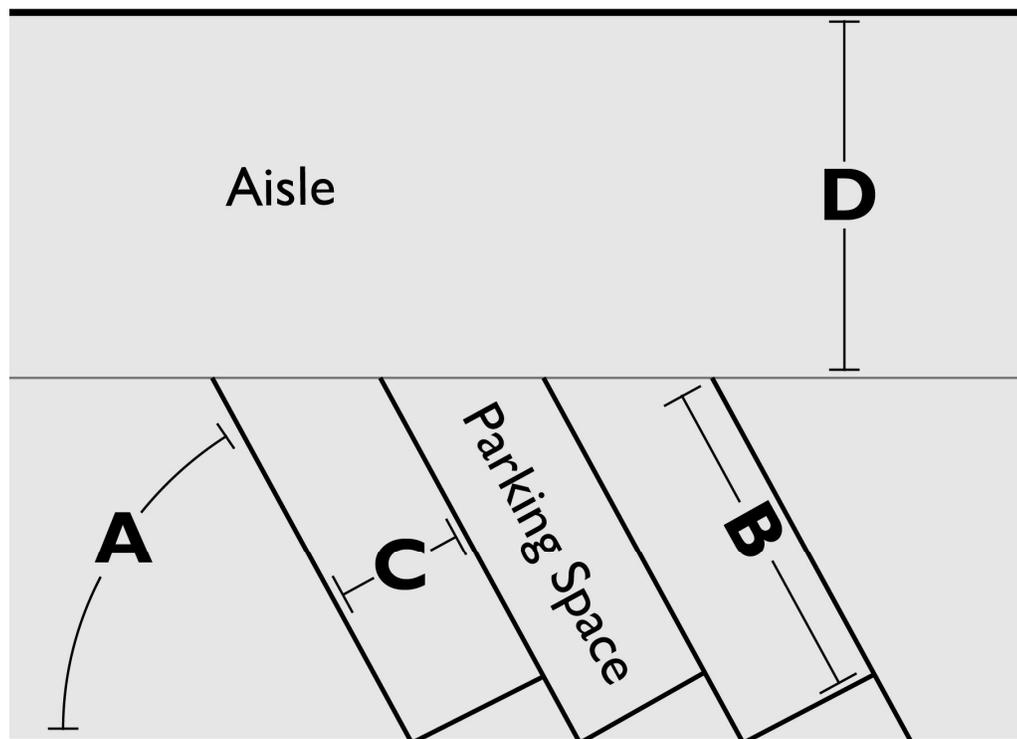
Parking Space and Drive Aisle Dimensions
